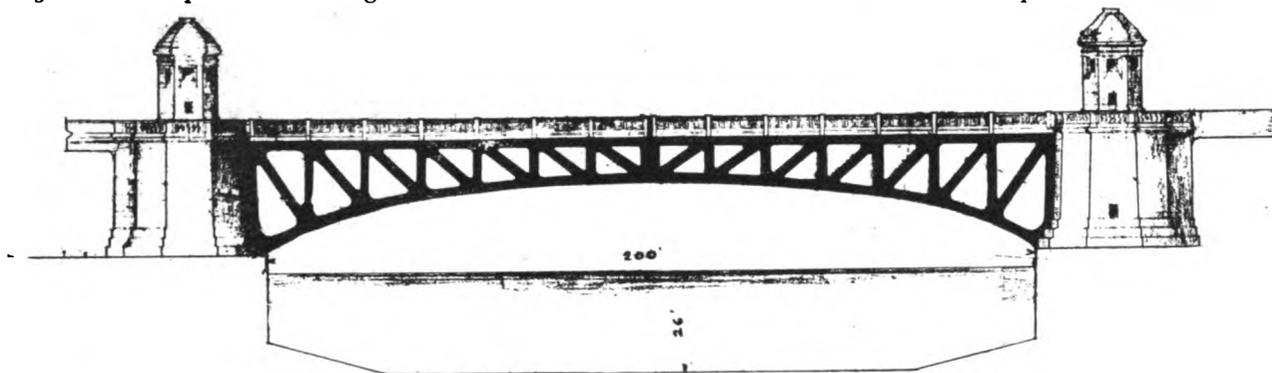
Double Leaf Bridge, Scheme No. 2, Over New Channel.
